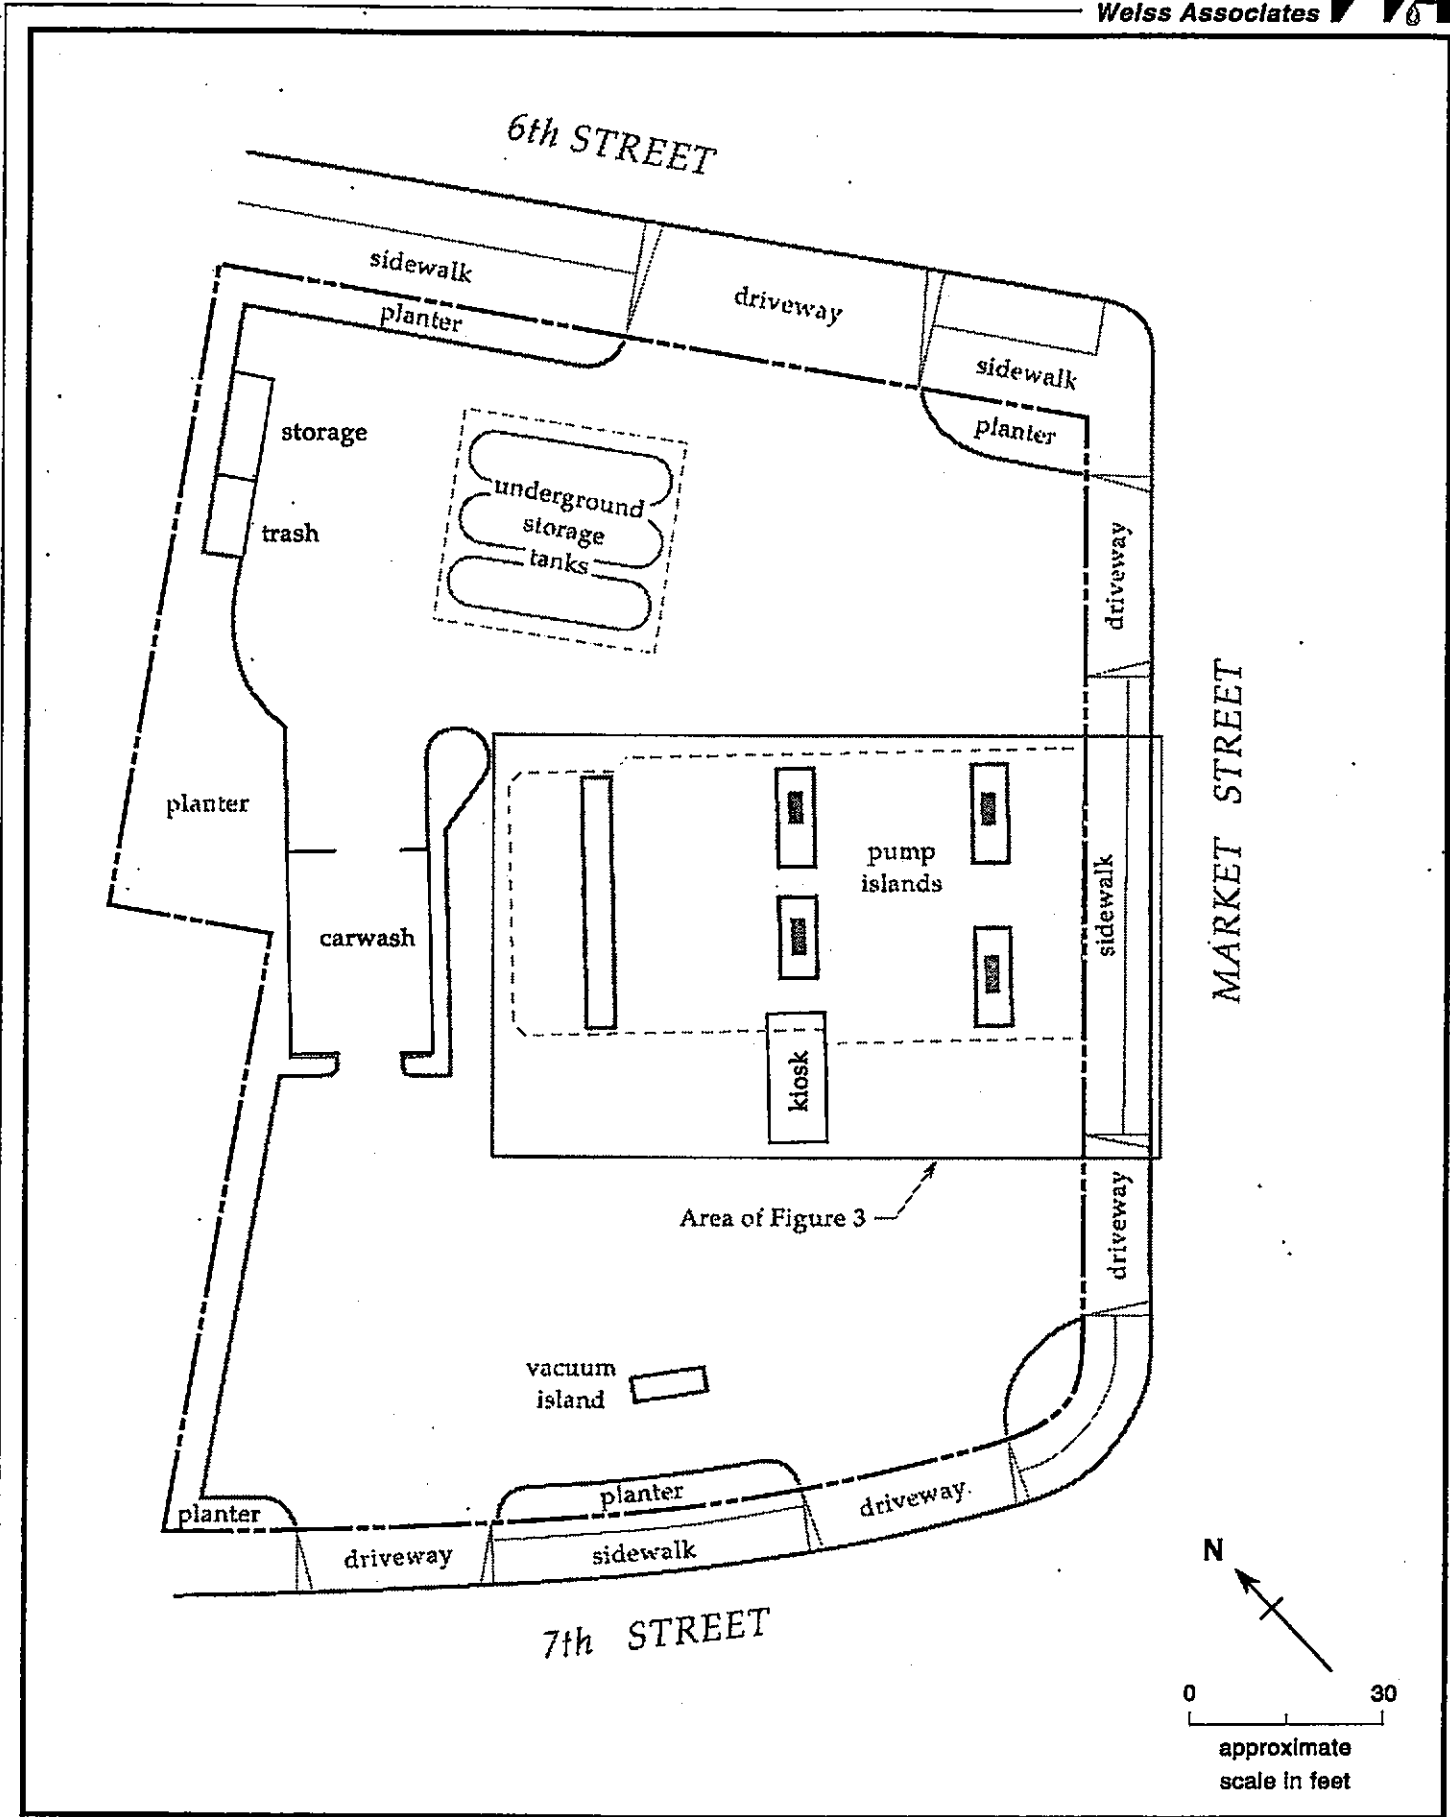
Site Layout - Shell Service Station WIC# 204-5508-5702, 610 Market Street, Oakland, California
